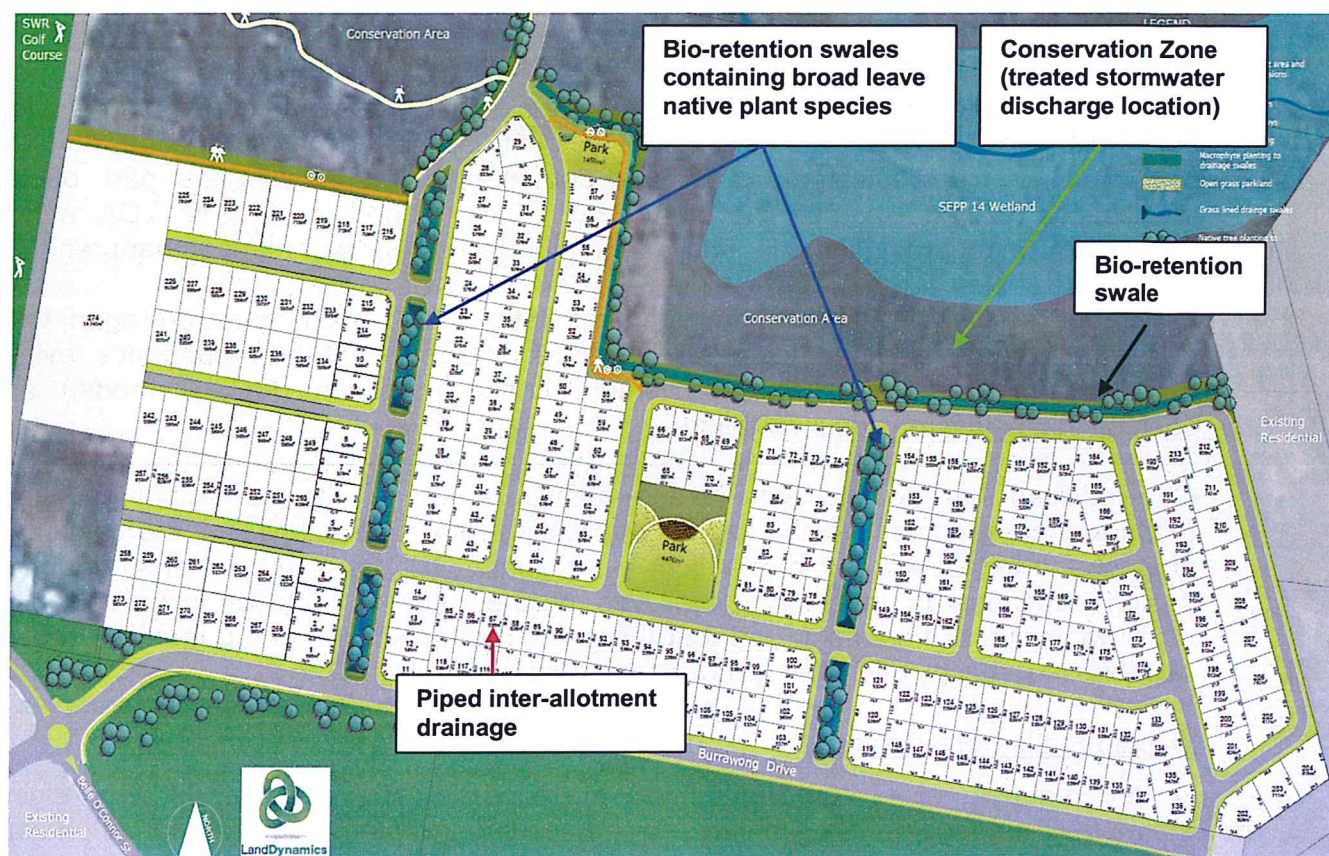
Proposed Stormwater Management Features – Revised Subdivision Plan (source: LDA)
